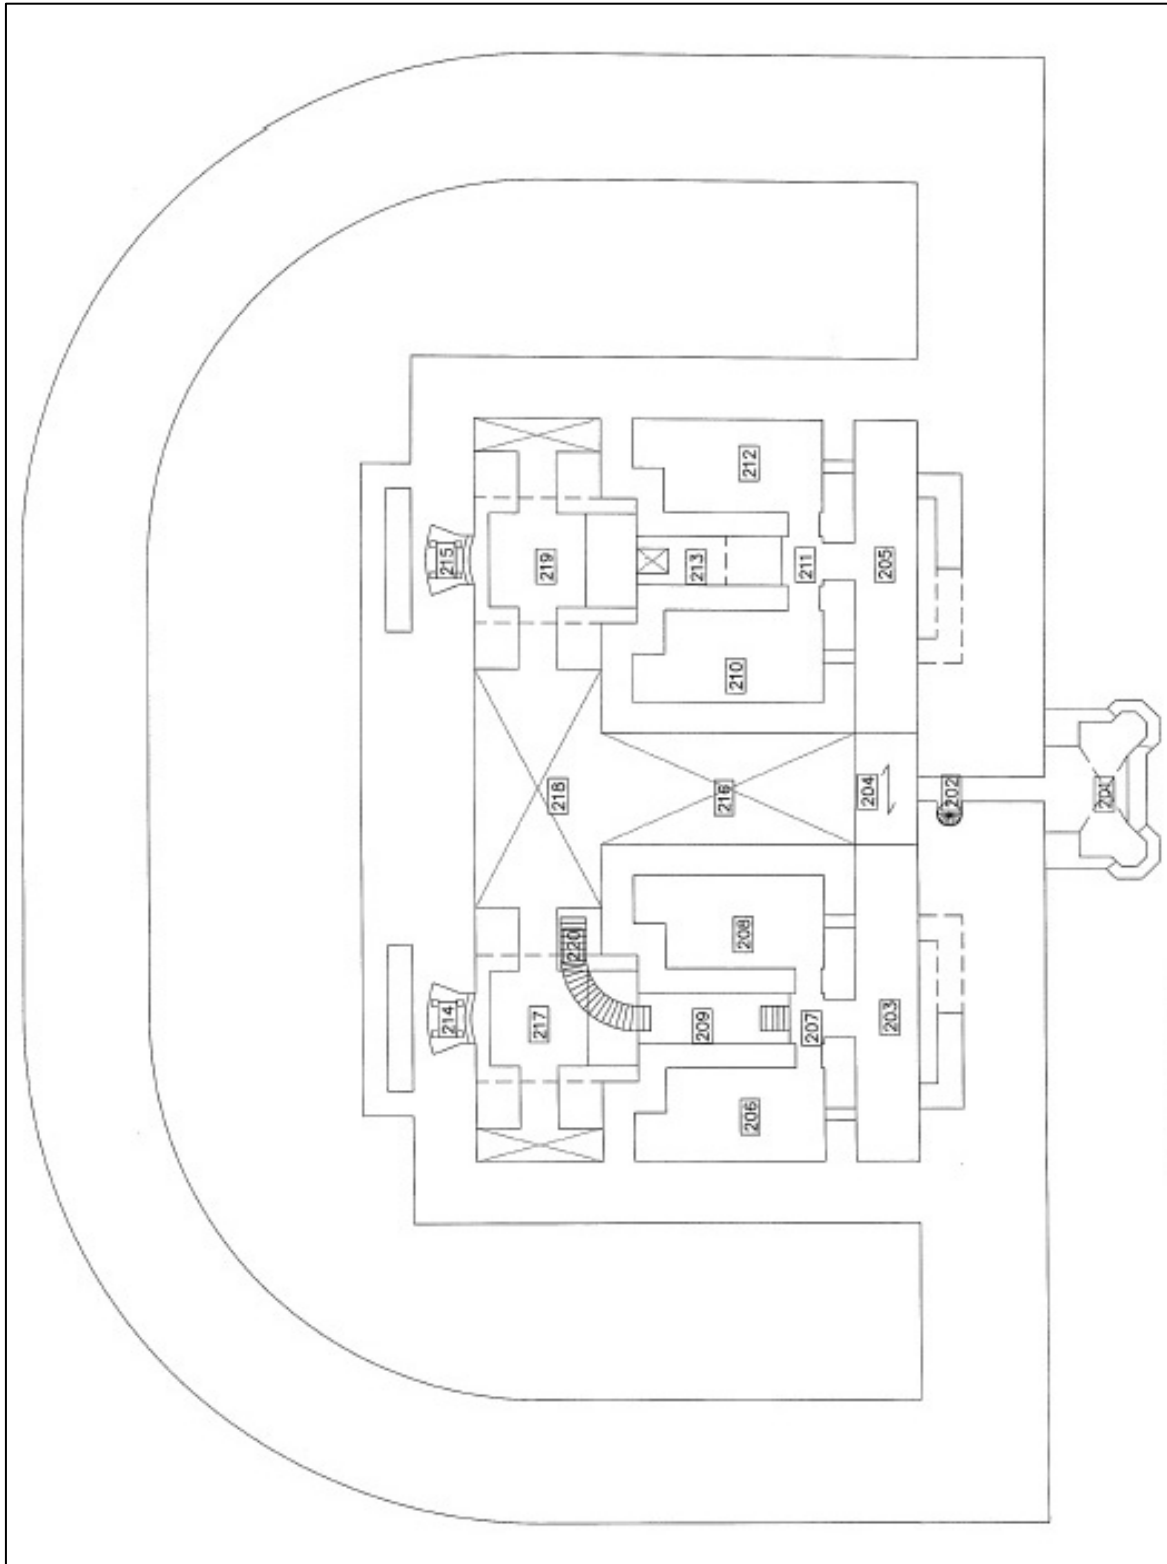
Battery Potter, second-floor plan with room numbers. Not to scale.
